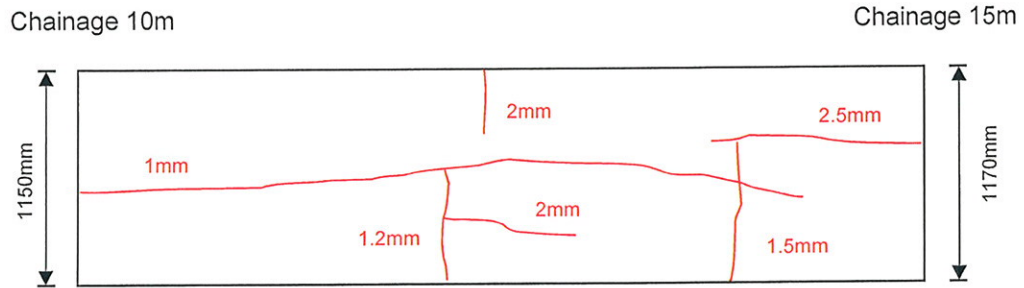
Wall Height, Crack Locations and Sizes for Chainages 10m to 15m
